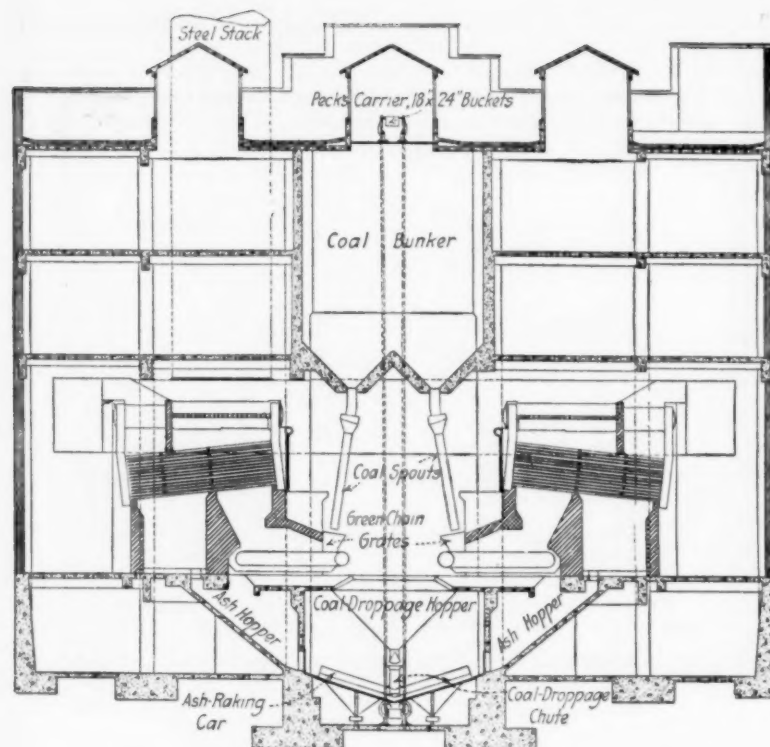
CROSS-SECTION OF BOILER ROOM WITH PECK CARRIER
